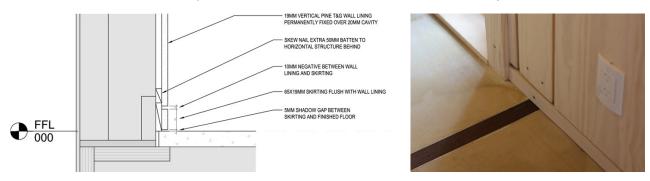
Detail for removable skirting (left) and photo showing continuous skirting over the module join (right)
